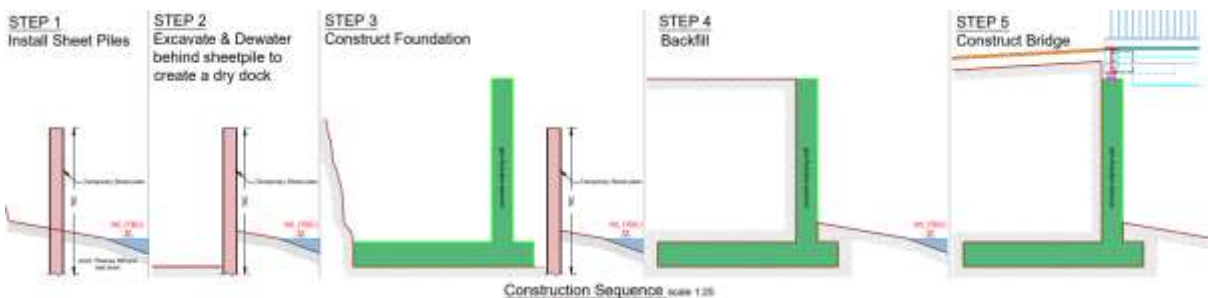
Construction sequence for abutment structures to support the steel deck of Bridge 5 (refer to drawing RHA-XX-DR-S-SP0052)
